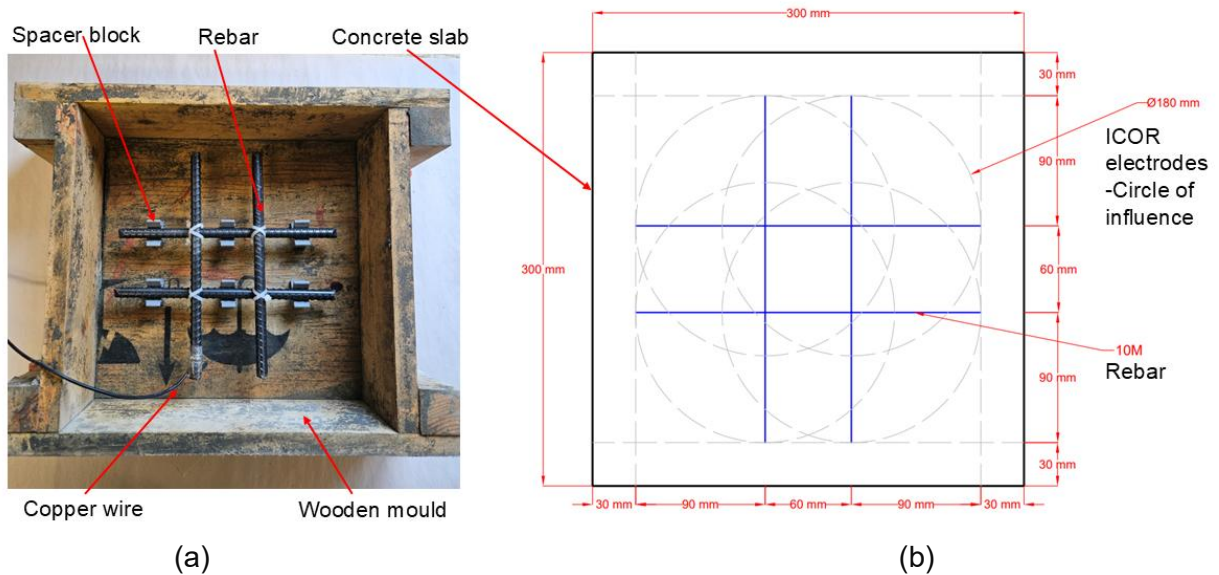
(a) Rebar layout for corrosion testing, and (b) Schematic sketch of rebar design in the slab
